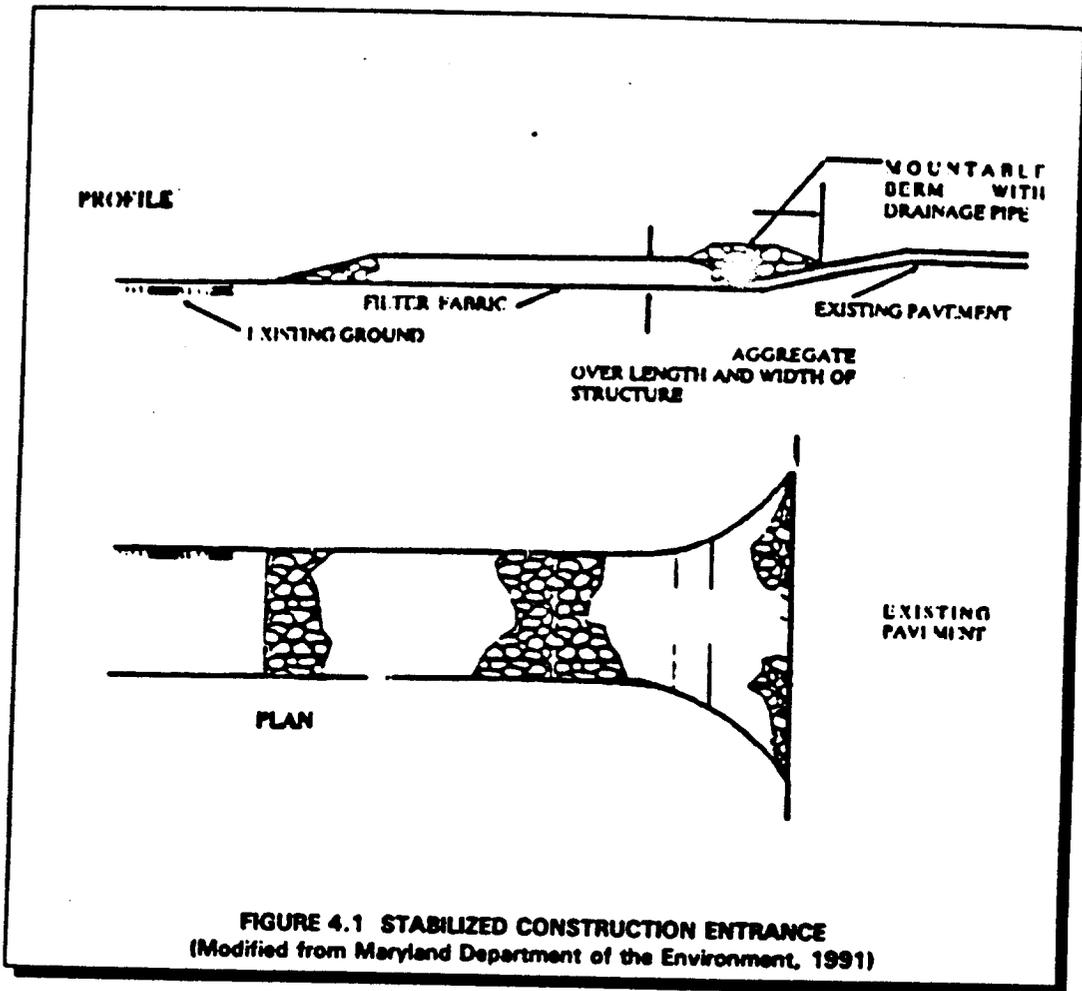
STABILIZED CONSTRUCTION ENTRANCE
